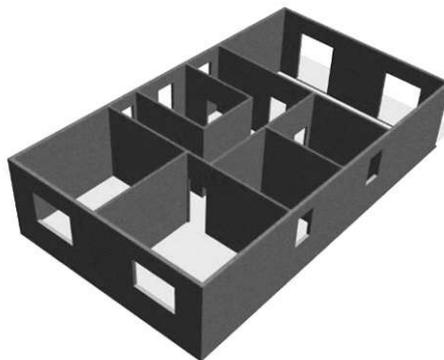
Level 4 layout of seven storey cross-laminated test building.
